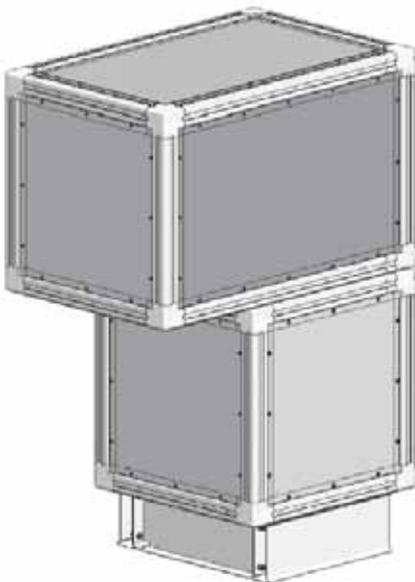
roof finish, unit with shorter top section without intermediate base frame
